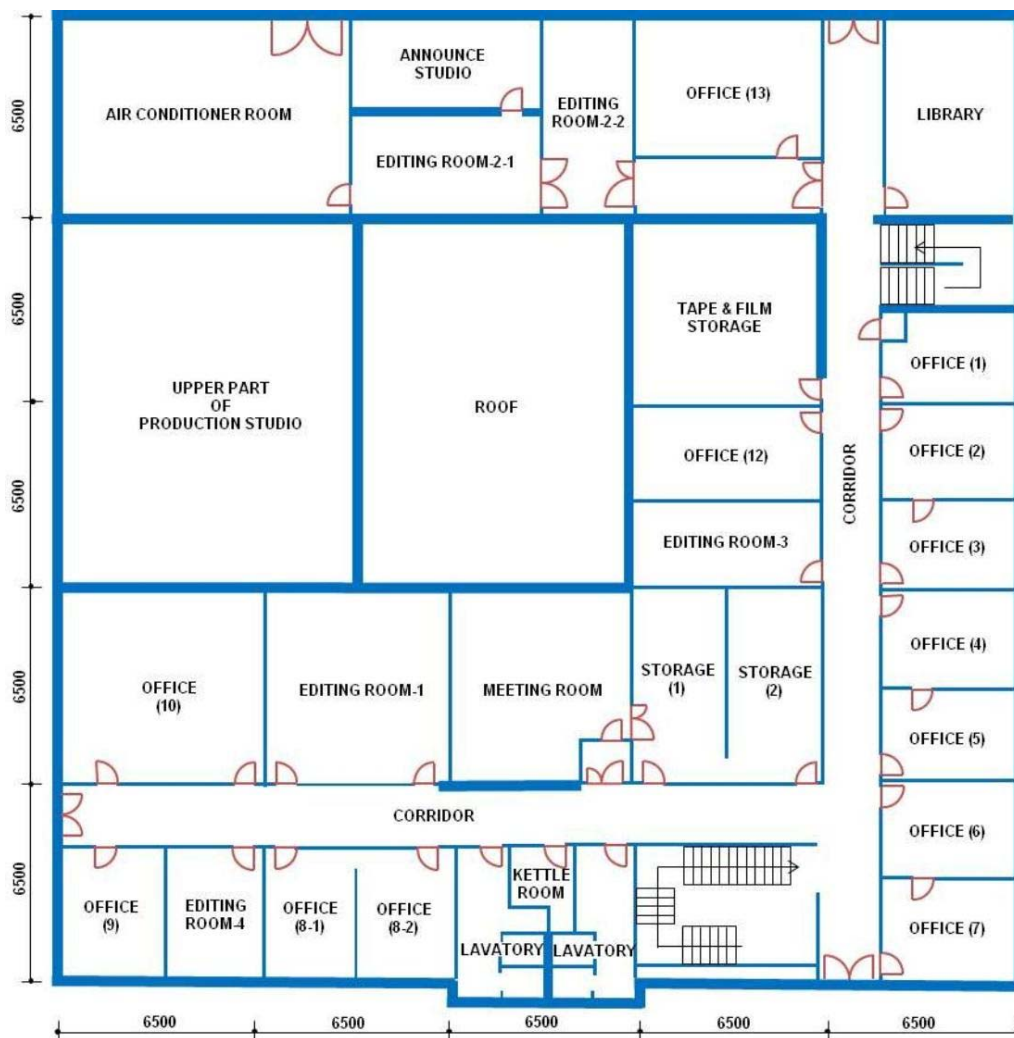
Kabul TV Station Floor Plan of Second Floor
